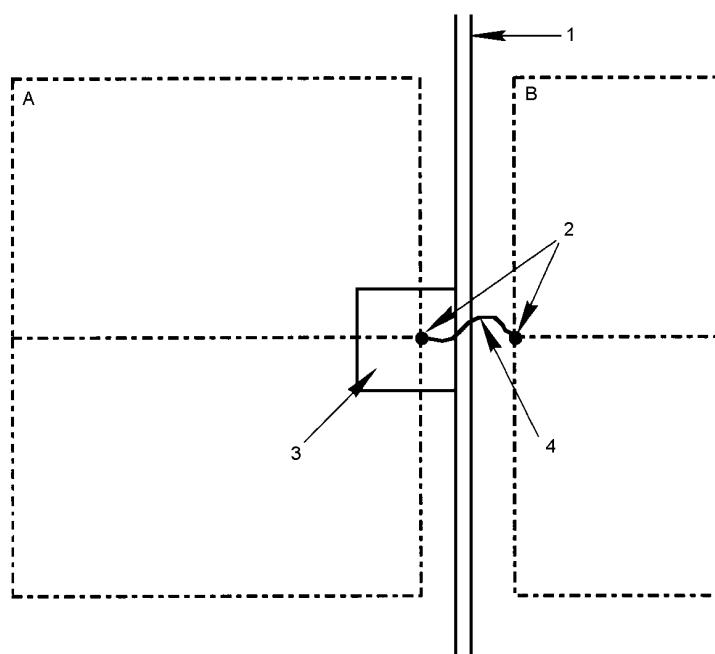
Installation of bonding conductors on plate-like prefabricated reinforced concrete parts by means of bolted or welded conductor links
